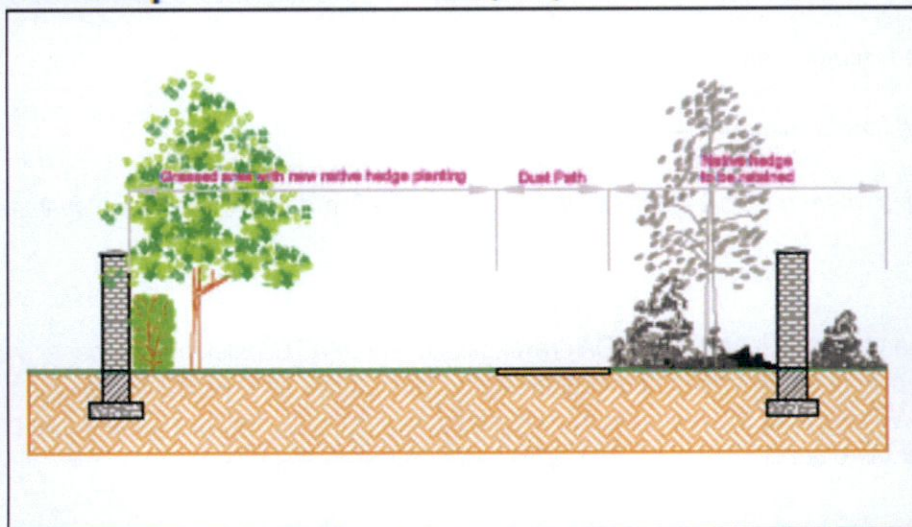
Copy of section Q – illustrating the proposed landscaping detail E-W across the westernmost local street south of Clonburris Link Street
